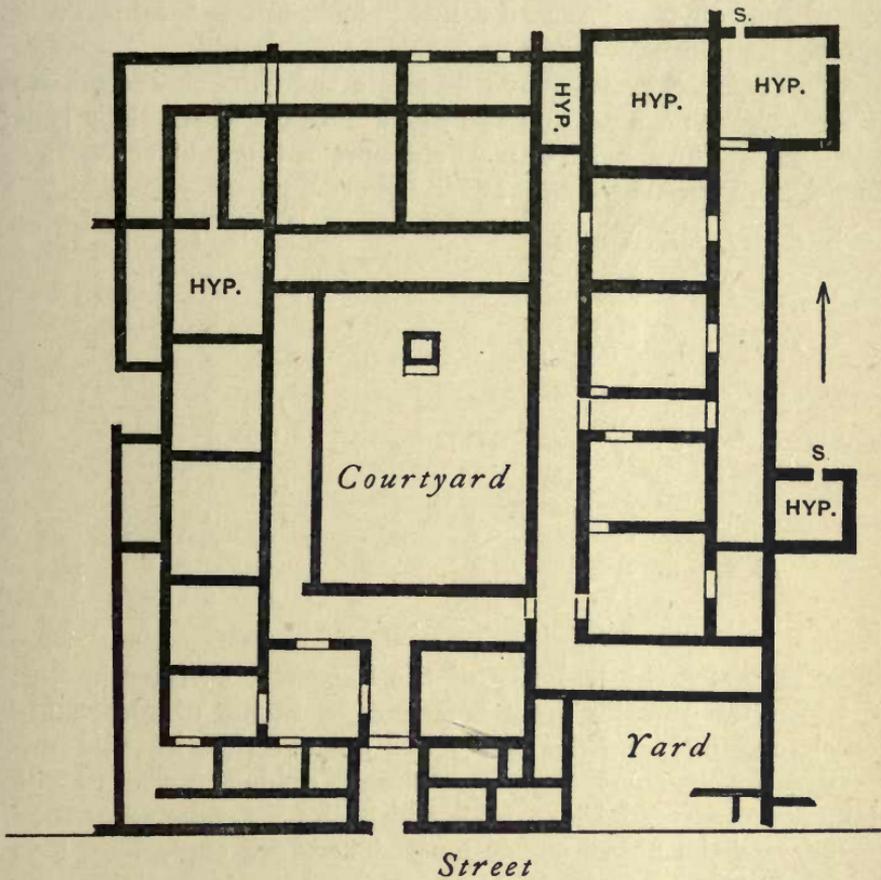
Plan of House, 1, xiv, Silchester. (After Hope.) (40 ft. to 1 in.)
